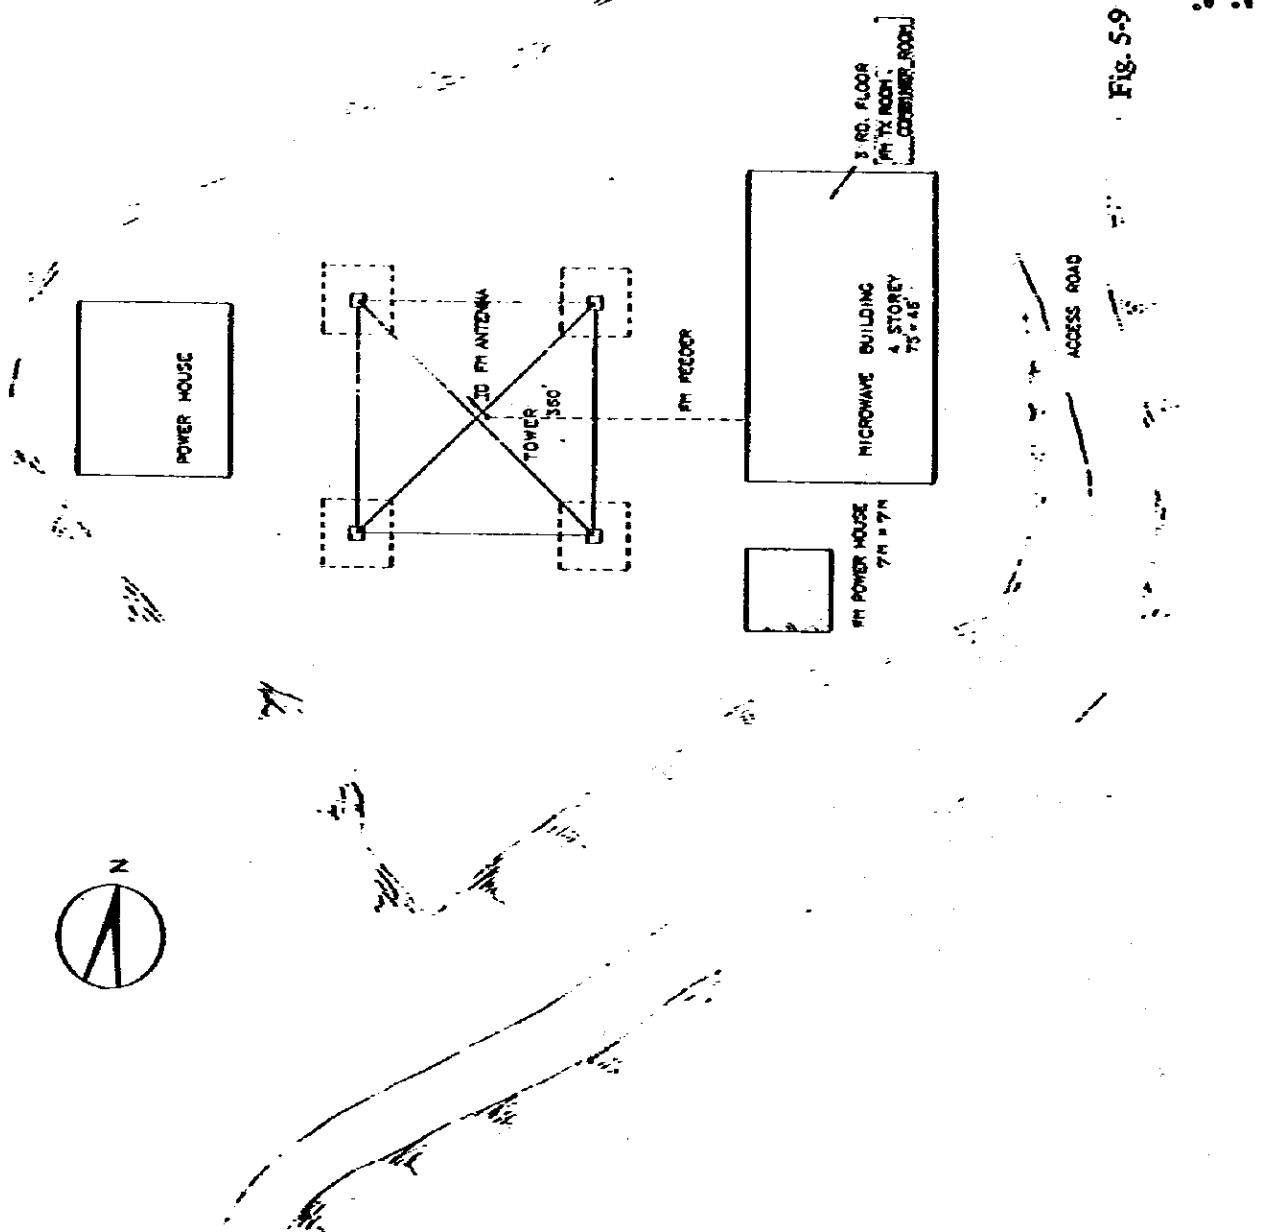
Site Plan - Mt. Ophir, Johor
